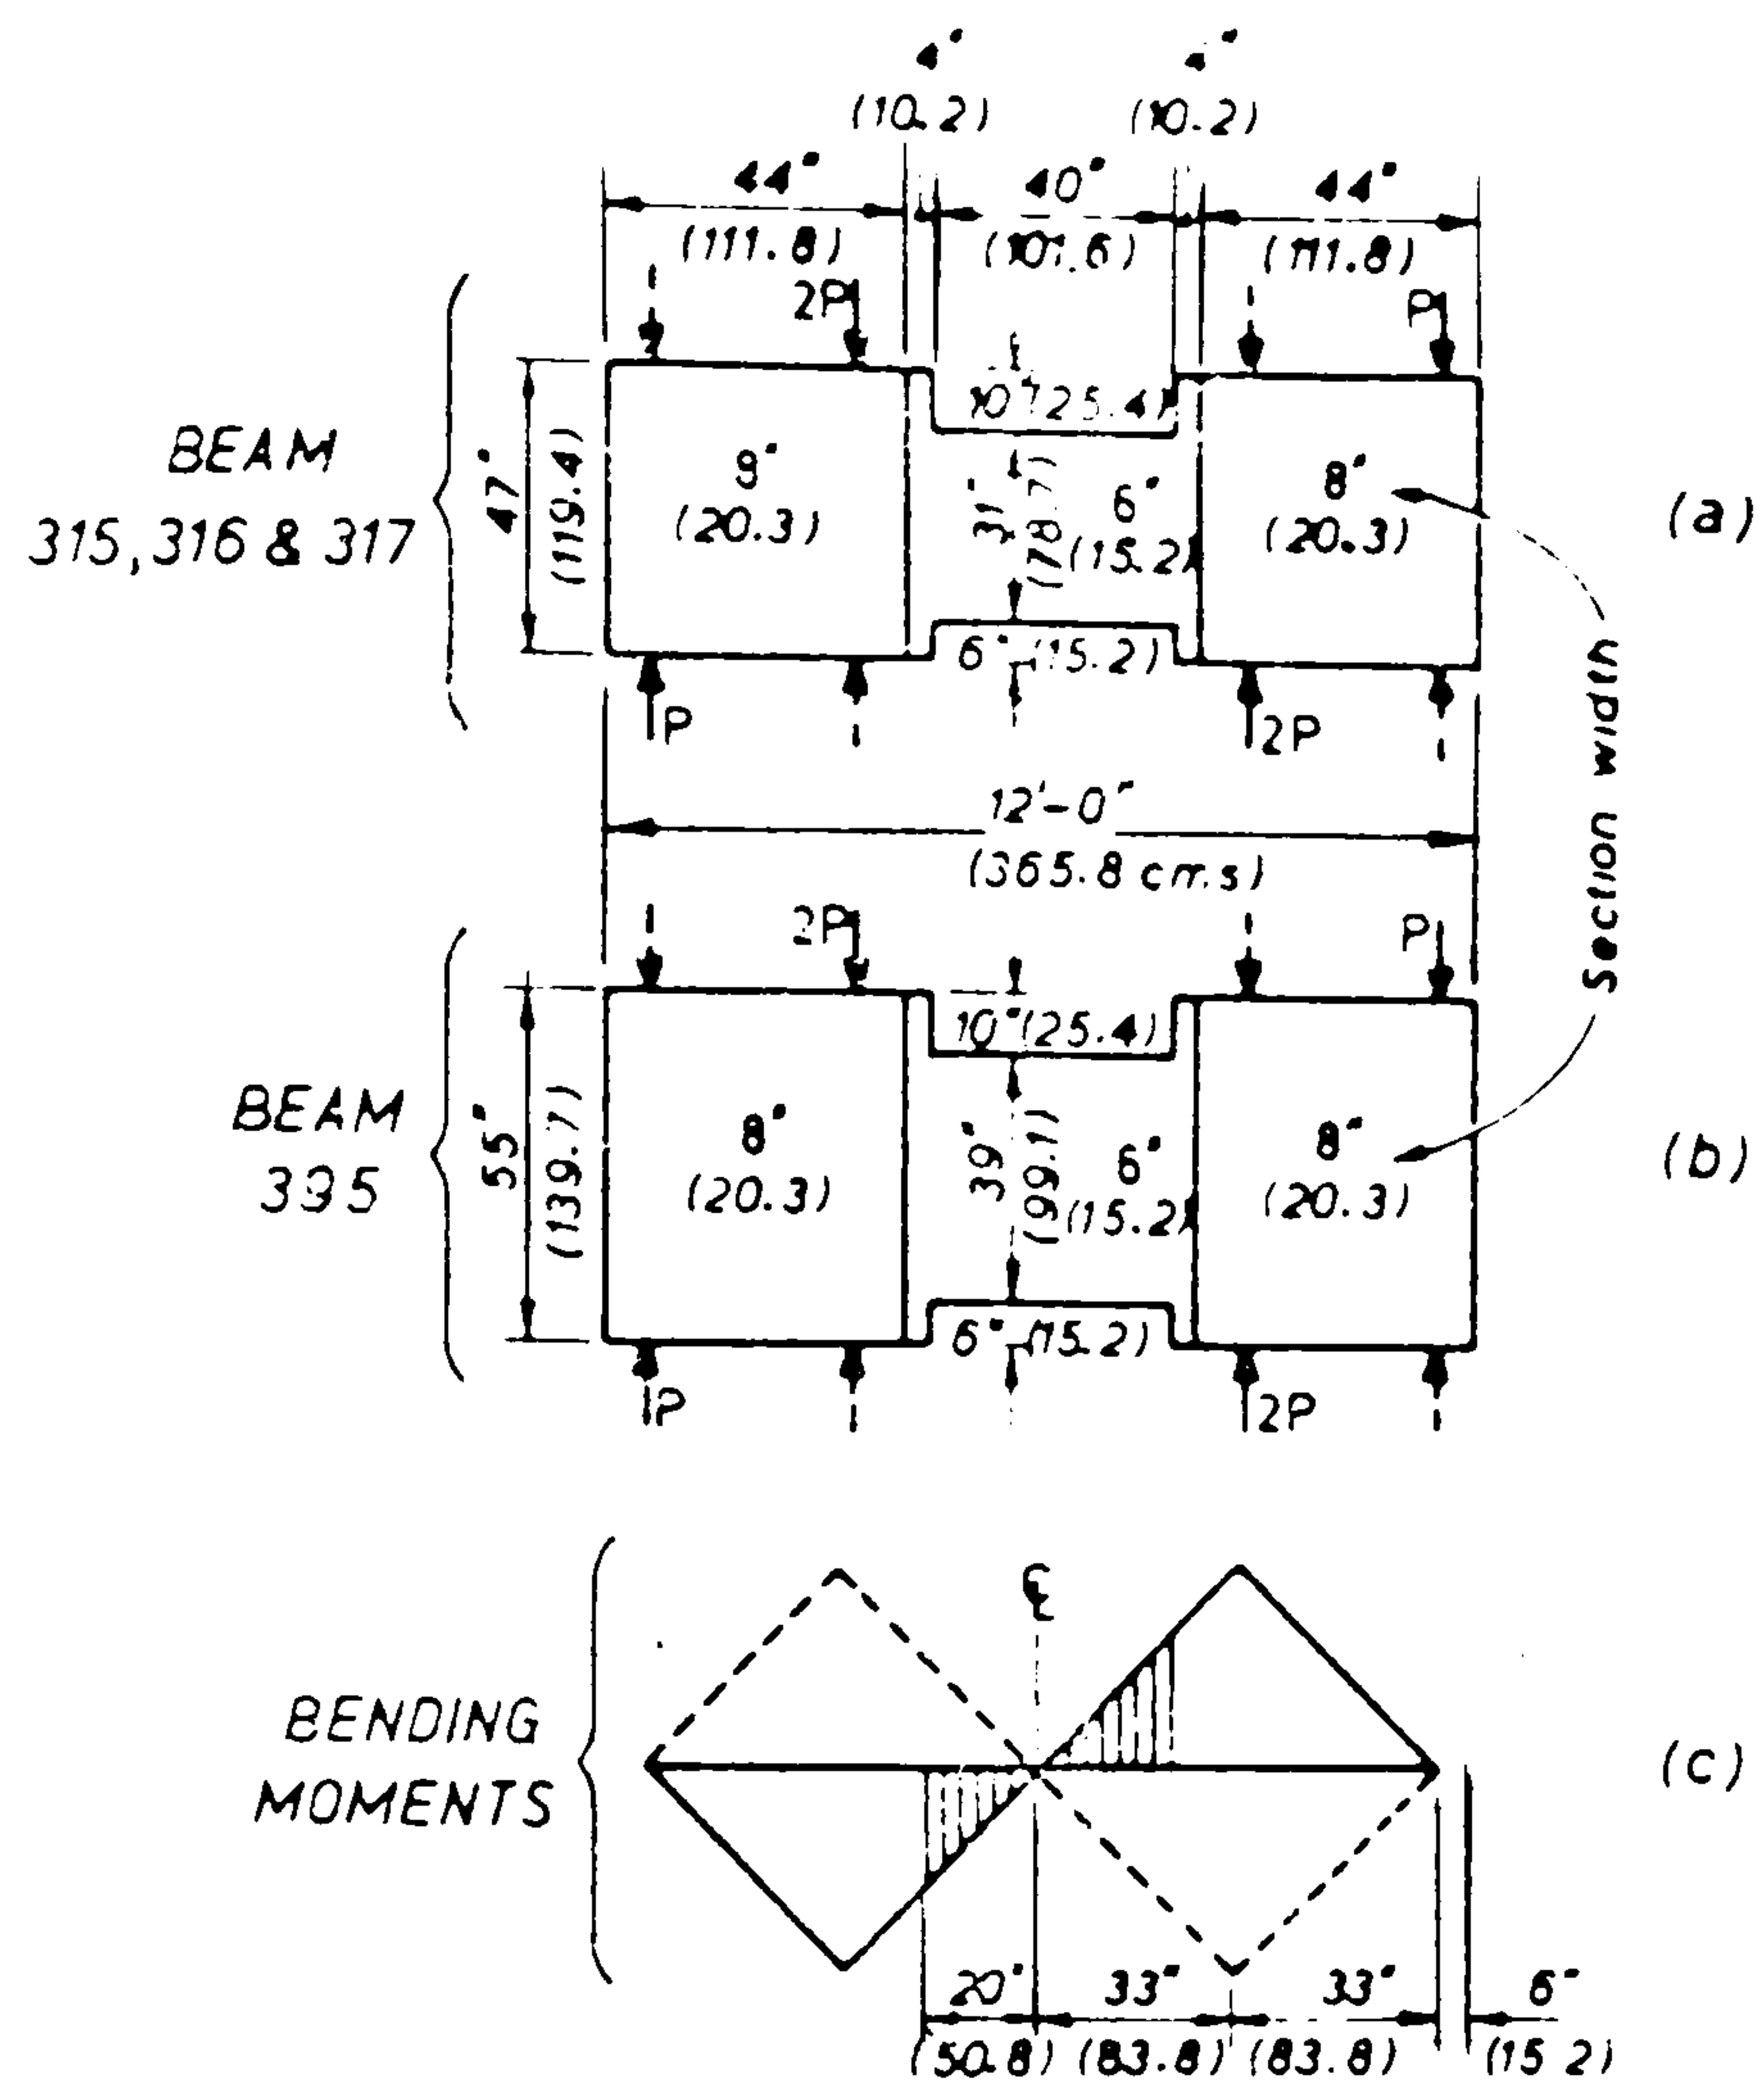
Principal dimensions and load pattern of test beams. Paulay and Binney [50]
